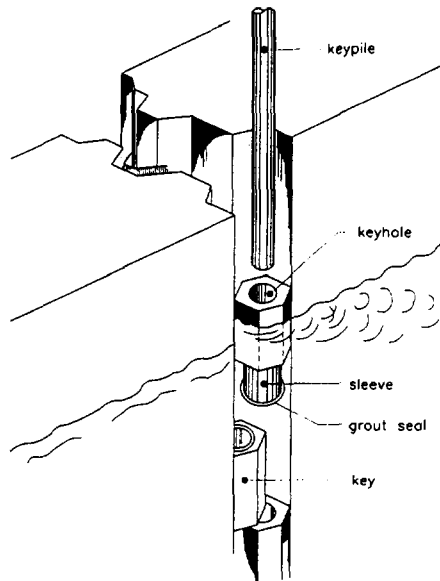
Contractual "key and key pile" concept for the connection between the half units
